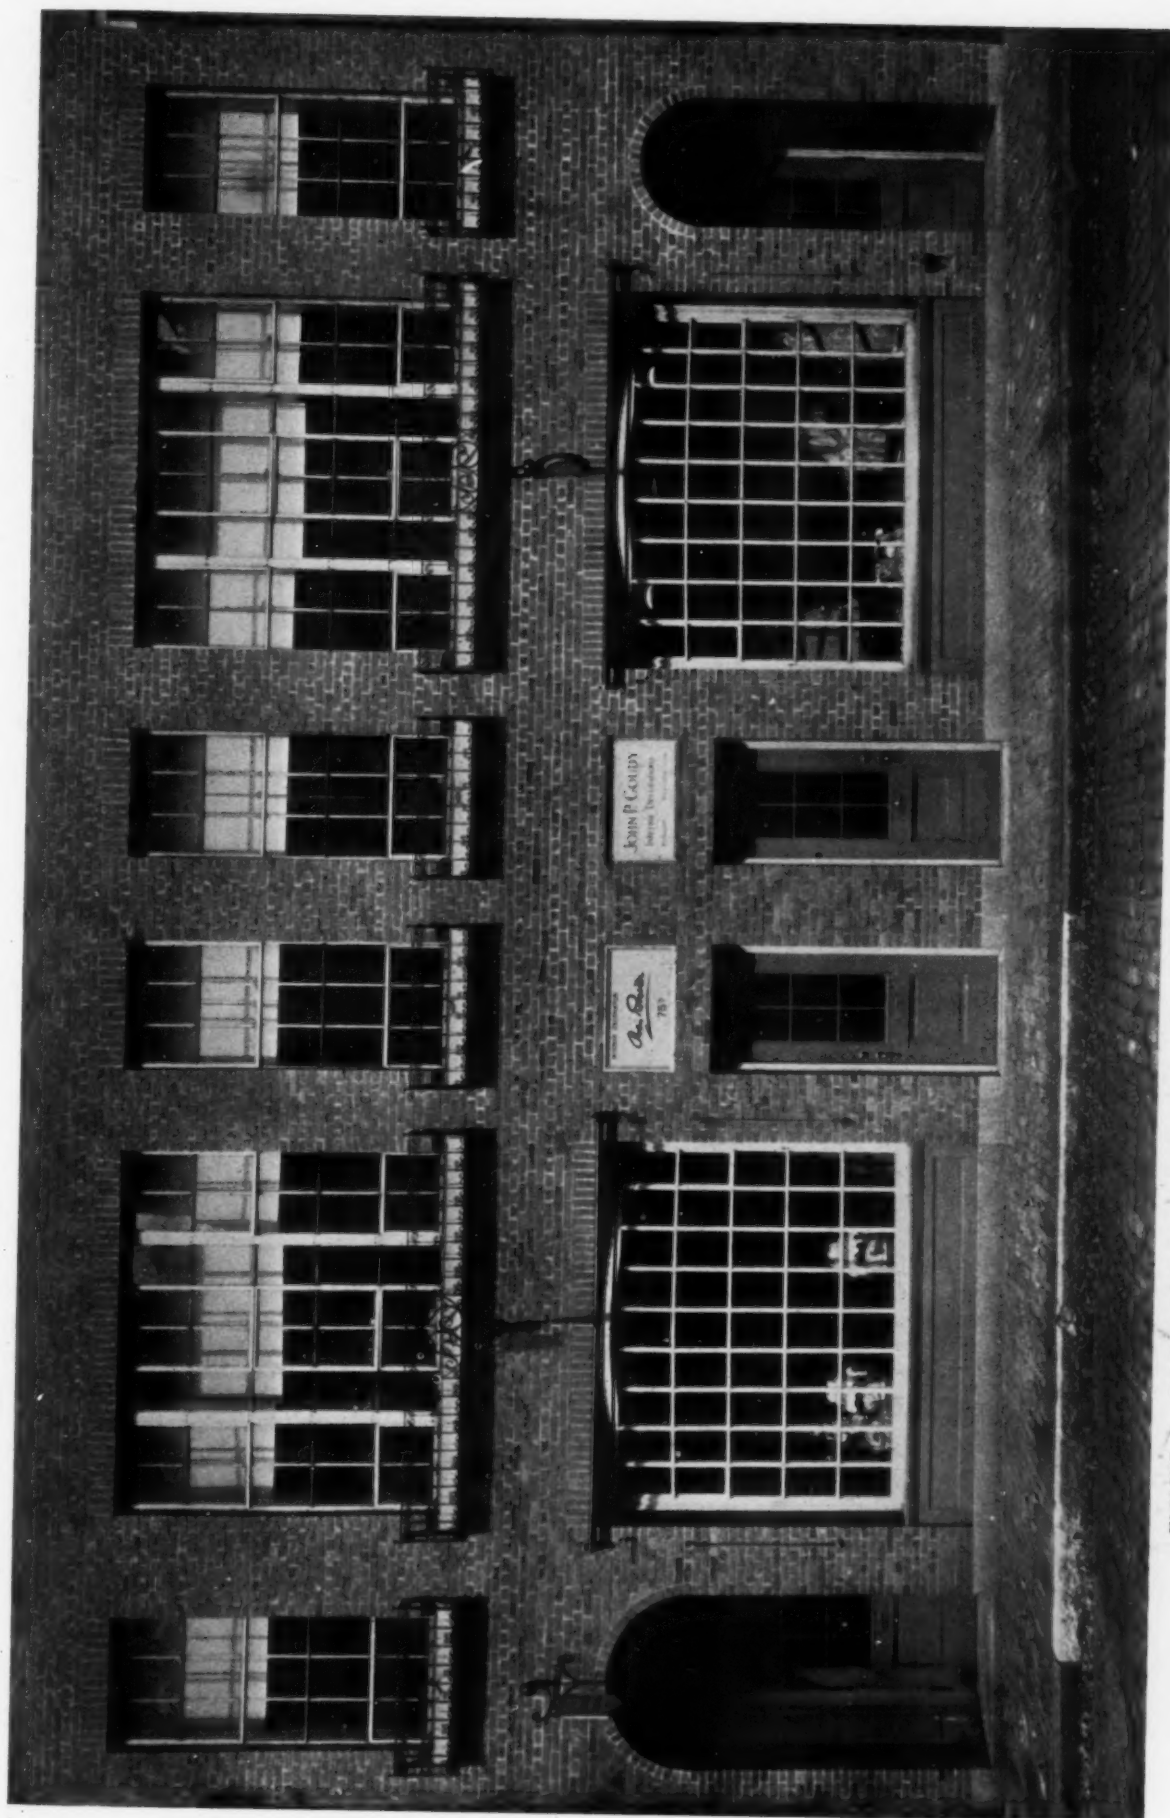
EXCELLENT ARRANGEMENT OF SHOW WINDOWS AND ENTRANCES TO UPPER FLOORS
